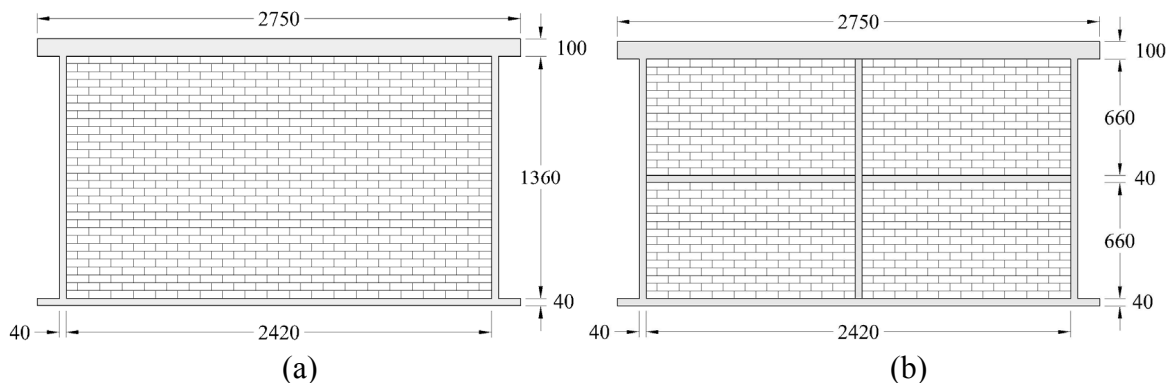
Geometric details of (a) Specimen 1 (b) Specimen 2
